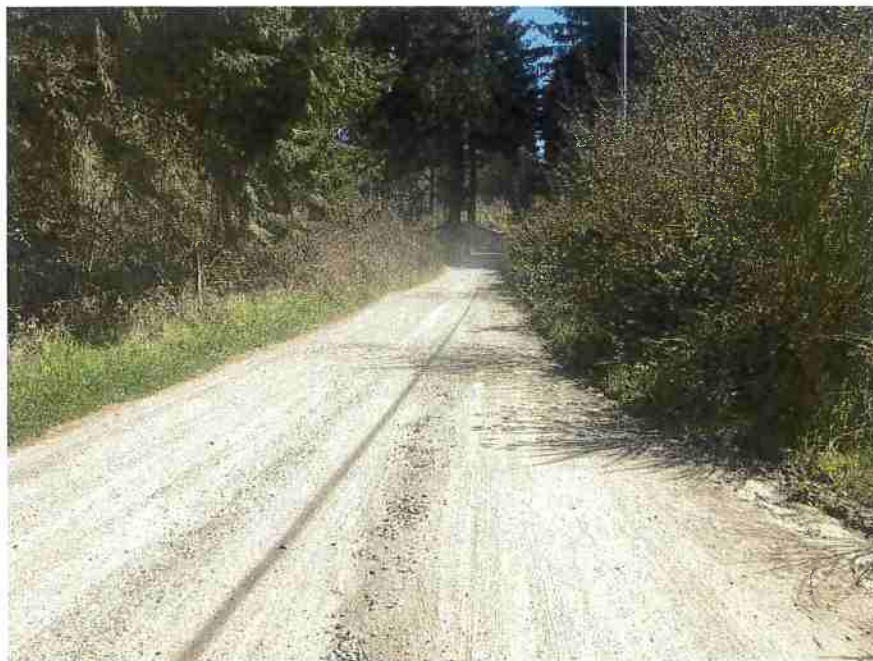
RP 2. Graveled Road Width 16' with 7' righthand turnout. Image shown facing east.
